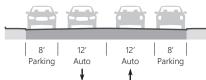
ZOE AVENUE EXISTING CROSS-SECTION
